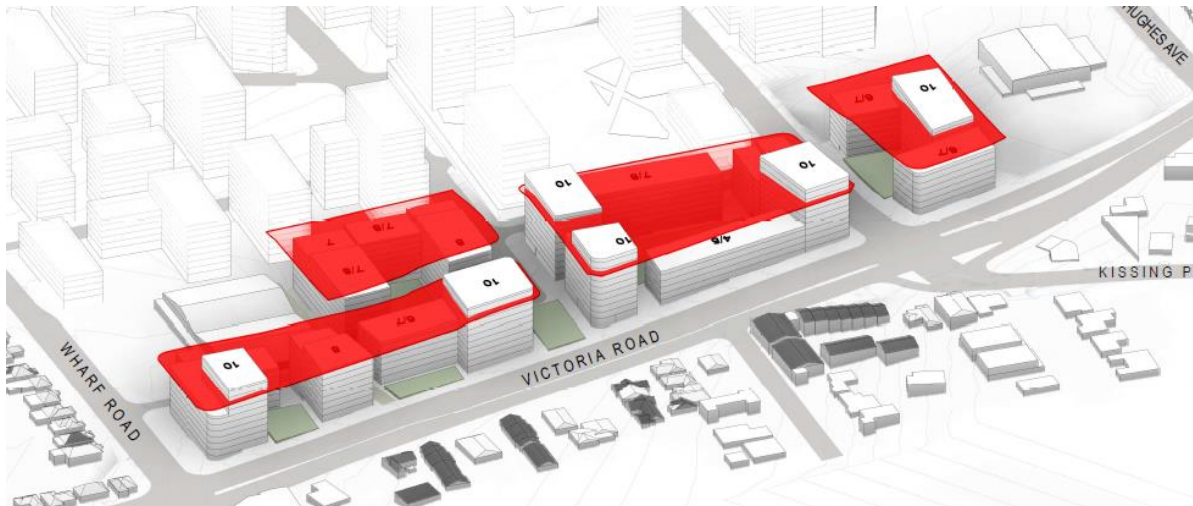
Building Envelope Height Breaches as approved (28m building height plane in red).
